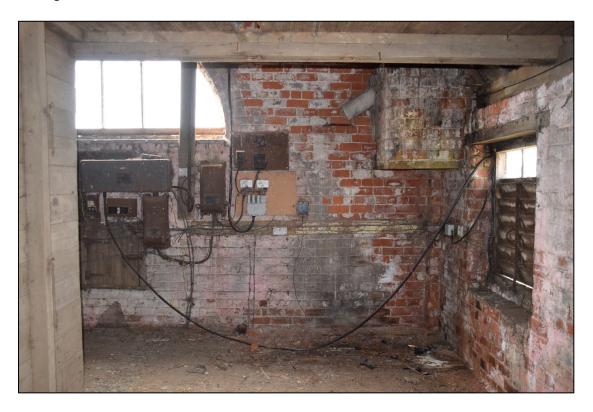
(left): The small store room [5]. Note the bullnosed brick around the window
